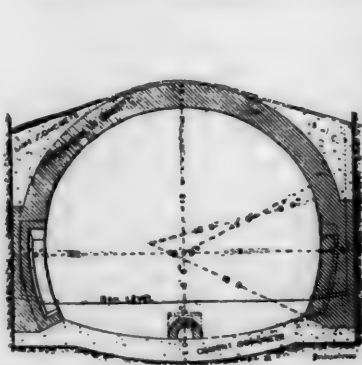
TRANSVERSE SECTION OF COVERED WAY No. 1
